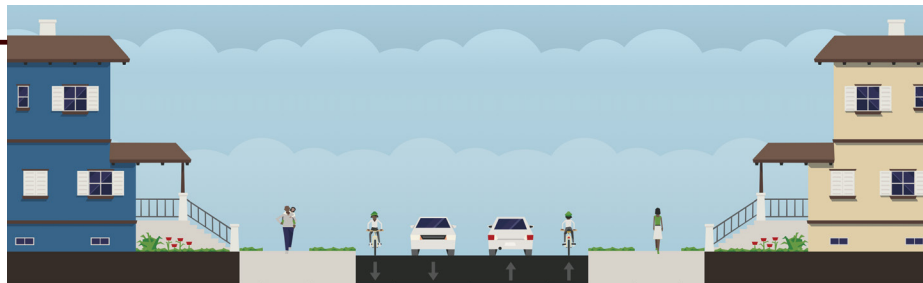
Potential recommendation for Greengarden Boulevard, West 16th Street to West 26th Street
